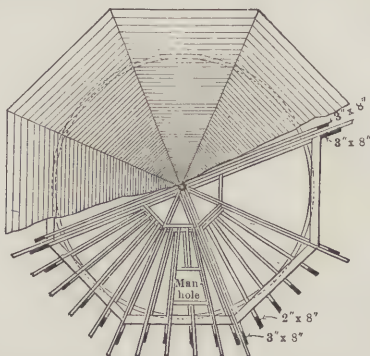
PLAN OF ROOF, SHOWING PART OF ITS FRAMING
